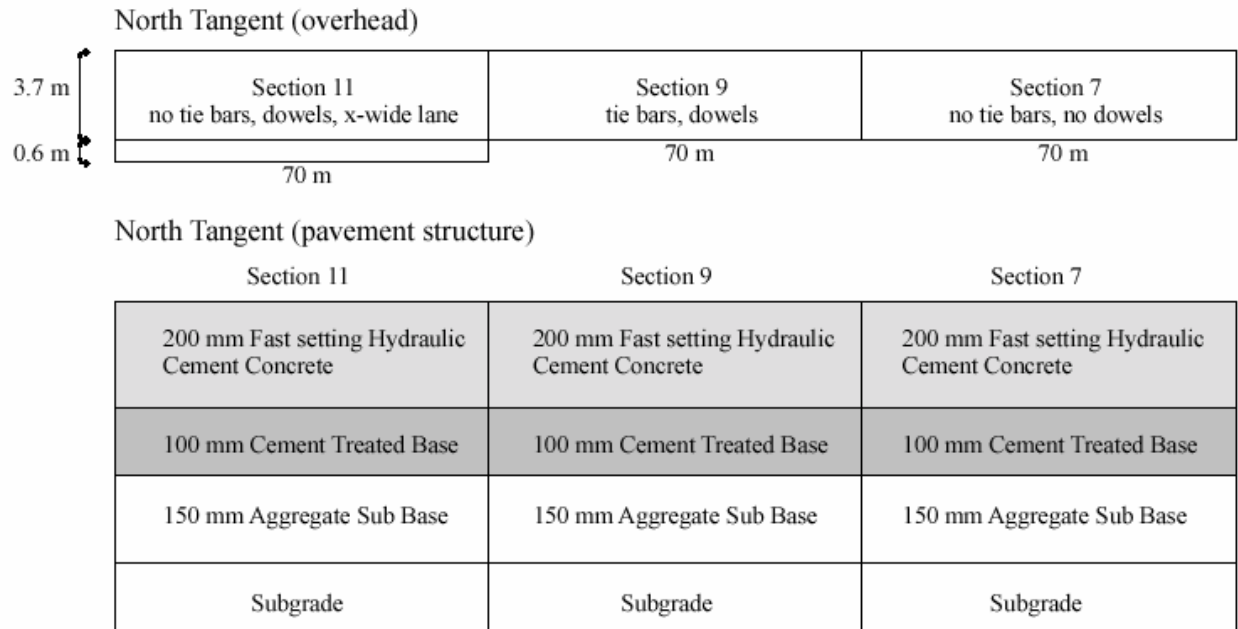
Pavement Structure Diagram for North Tangent (23).
